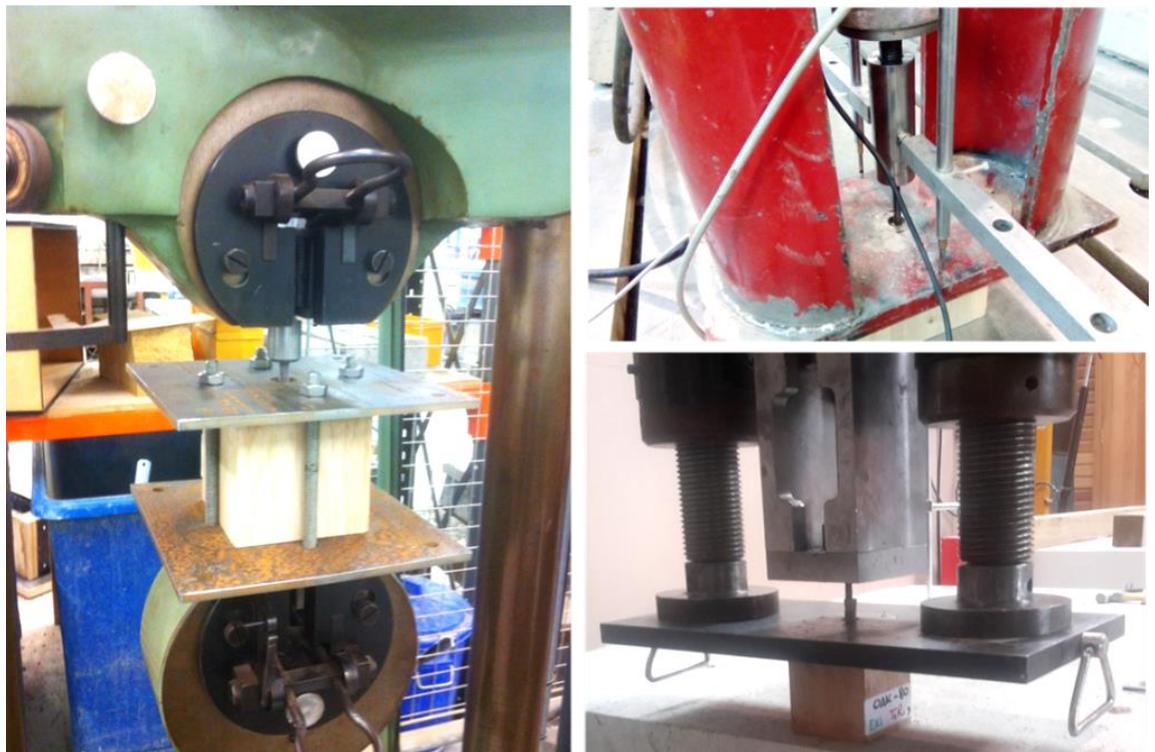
Avery Denison 6158 universal testing machine (left) and fatigue testing machines [load cell: 100 kN: right]
